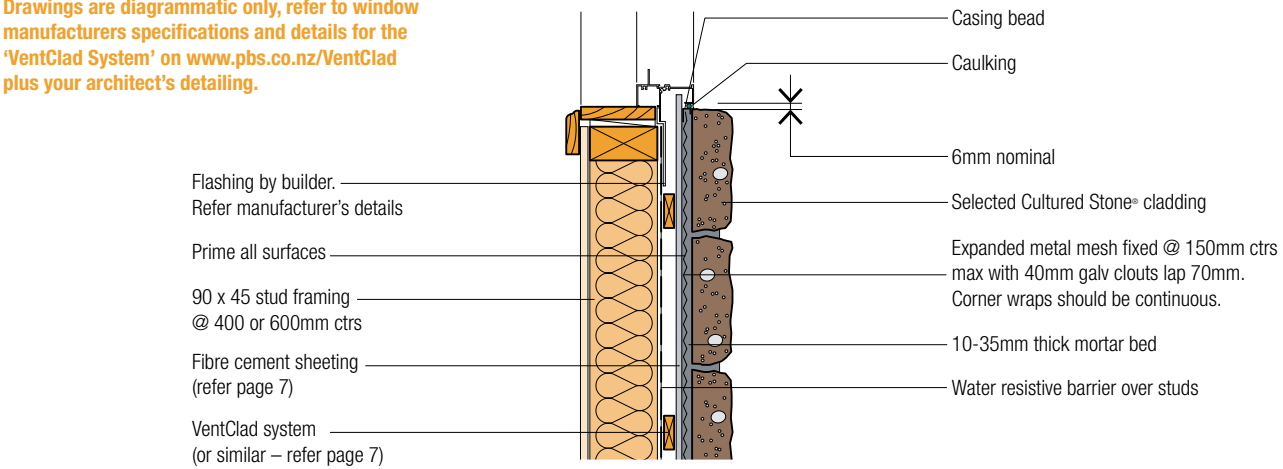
Typical Window Sill - Section (Dwg # CS-06.05)
